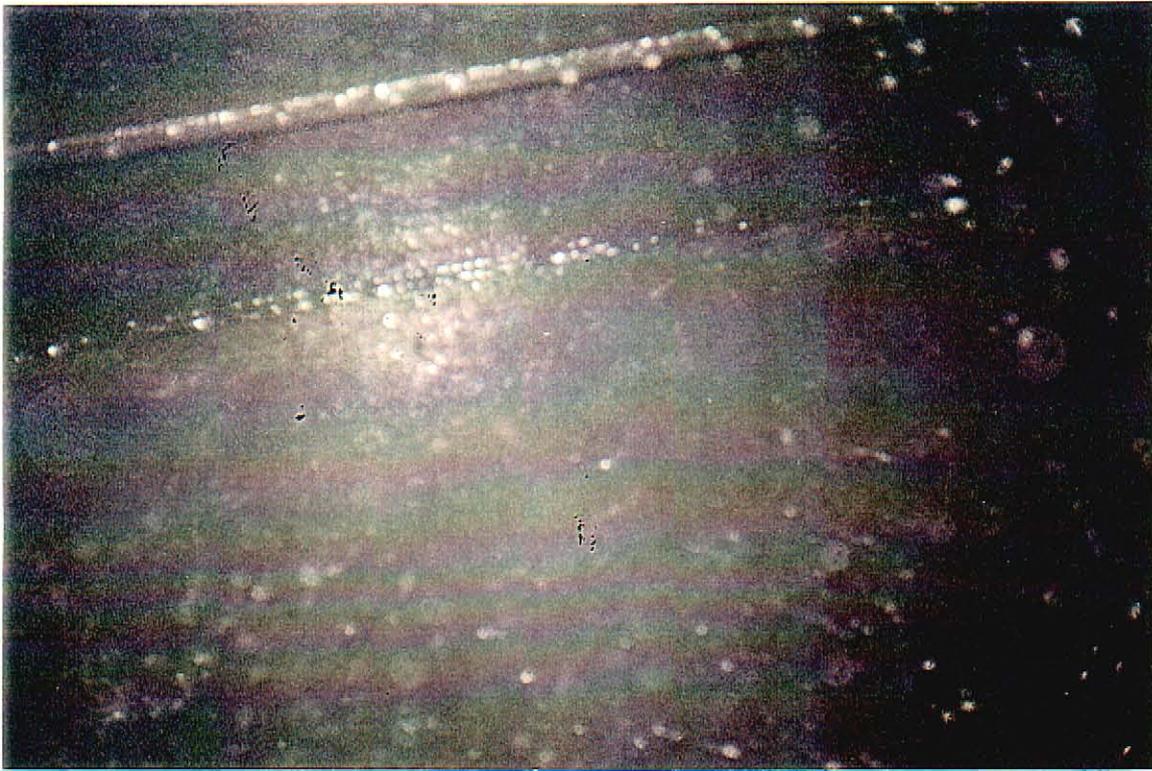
CLOSE-UP OF STEEL SURFACE IN WEB OF END TRUSS
